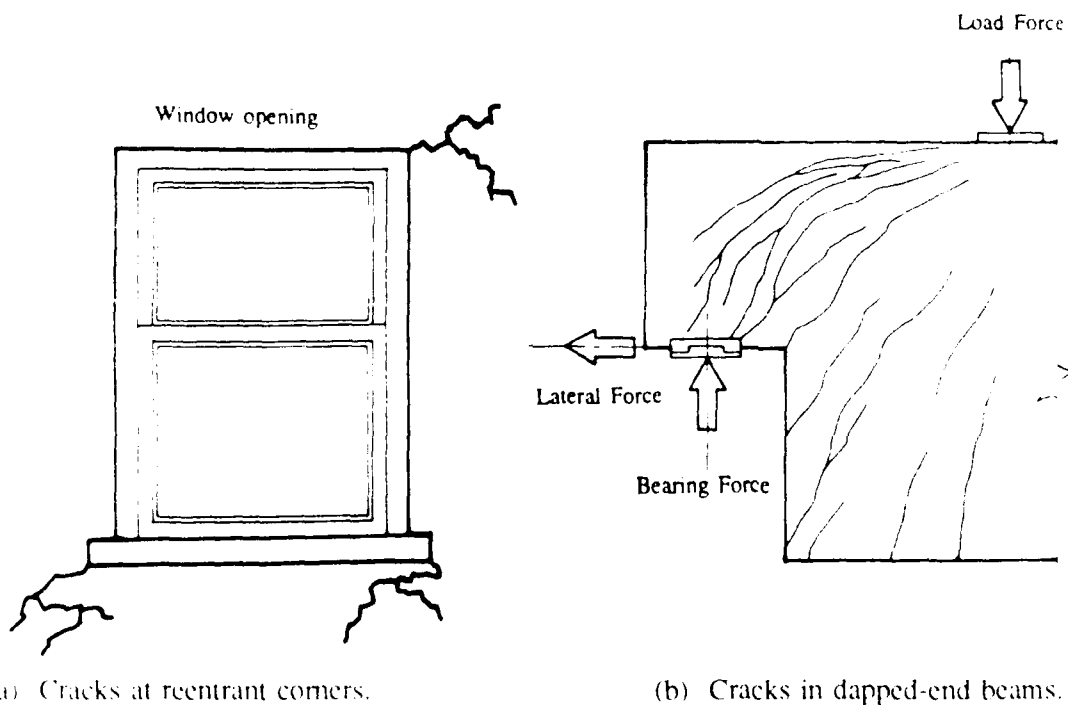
Typical crack patterns at reentrant corners and dapped-end beams.
